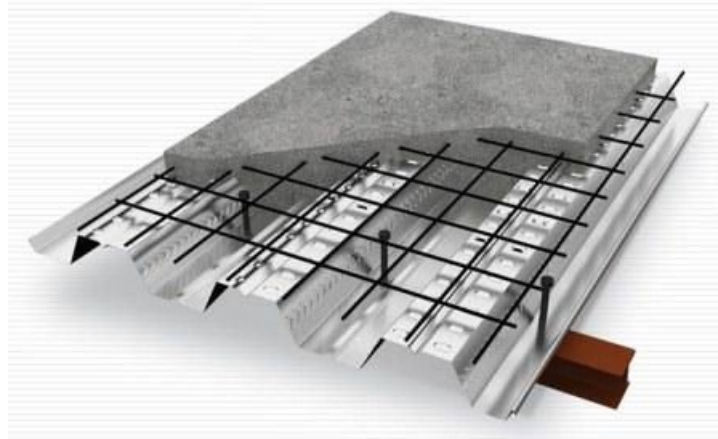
Concrete floor on metal deck (Www.dianliwenmi.com, 2016)
